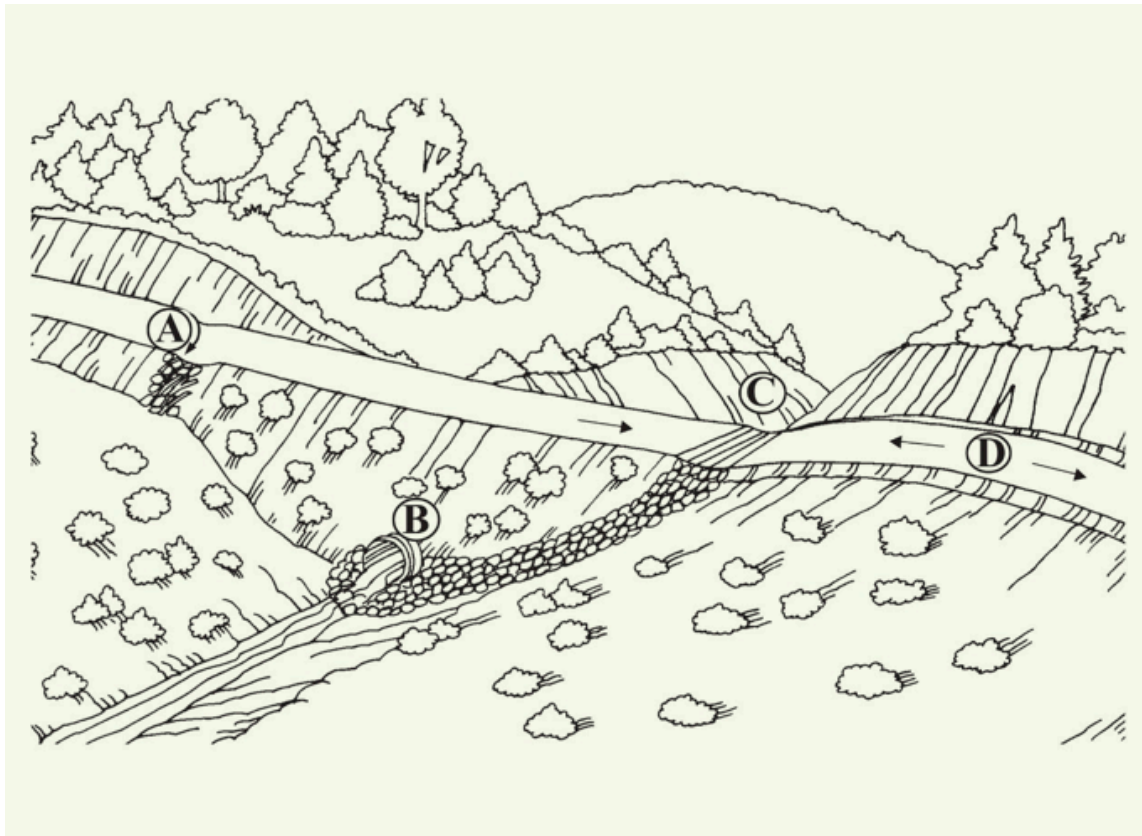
Critical dips or dipped crossing fills should be centered near a stream crossing's down-road hingeline, not over the centerline of the crossing where overtopping could cause washout or severe erosion of the fill. If the stream crossing culvert (B) plugs, water will pond behind the fill until reaching the critical dip or low point in the crossing (C) and flowing back down into the natural stream channel. The down-road ditch must be plugged to prevent streamflow from diverting down the ditch line. For extra protection in this sketch, riprap armor has been placed at the critical dip outfall and extending downslope to the stream channel. This is only required or suggested on stream crossings where the culvert is highly likely to plug and the crossing fill overtopped. The dip at the hinge line is usually sufficient to limit erosional damage during an overtopping event. Road surface and ditch runoff is disconnected from the stream crossing by installing a rolling dip and ditch relief culvert just up-road from the crossing (A) (Keller and Sherar, 2003).
